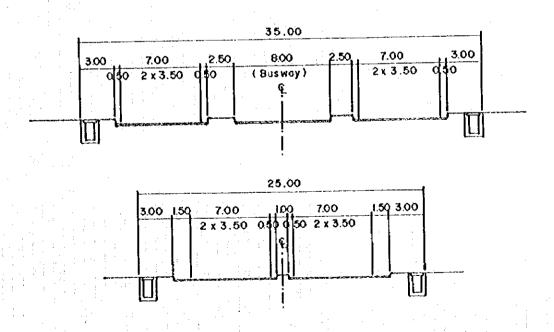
Typical Cross Section of Secondary Major Arterial Road (Type II/Class I)
